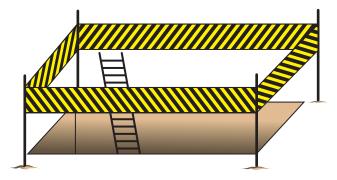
Place a barricade around a trench and use a ladder to enter and exit the trench.
